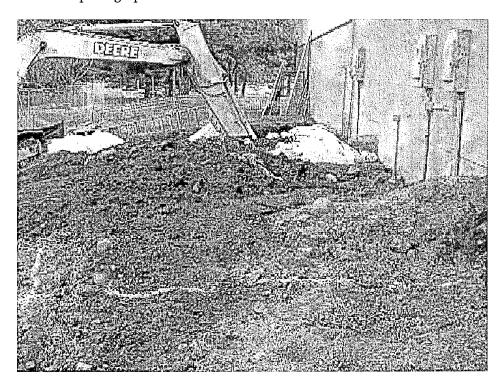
ERM collects the first confirmation sample of the west wall of the northern quadrant of the exterior excavation.
